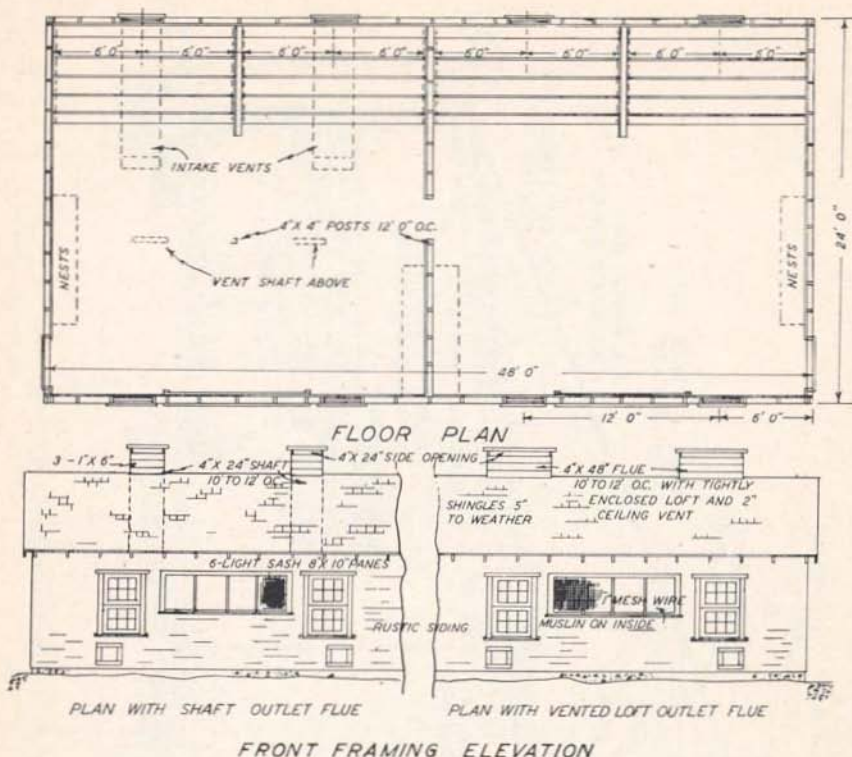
Floor plan and front elevation of gable ceiling insulated laying house.
